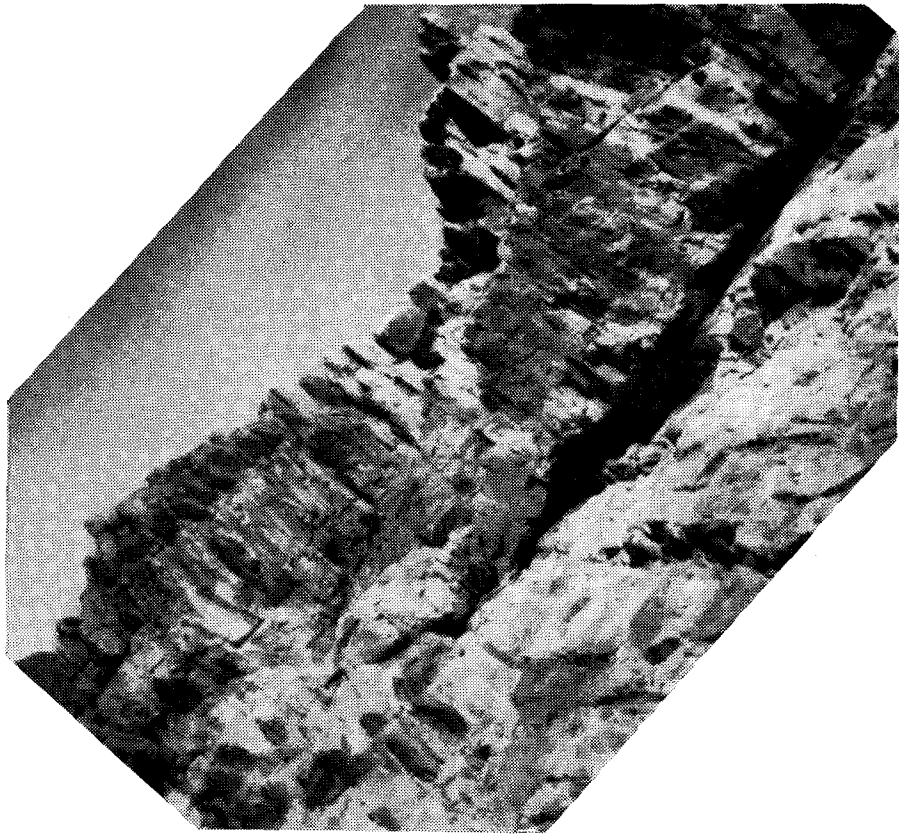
Western Abutment looking South showing open jointing in Quartzite.
